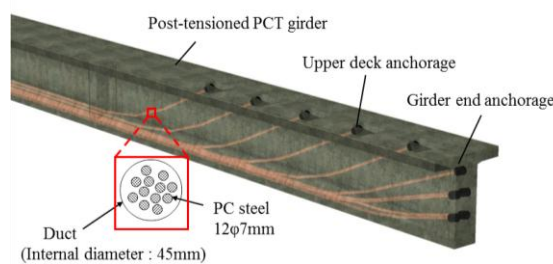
Schematic diagram of PC steel layout for PCT girder bridge
